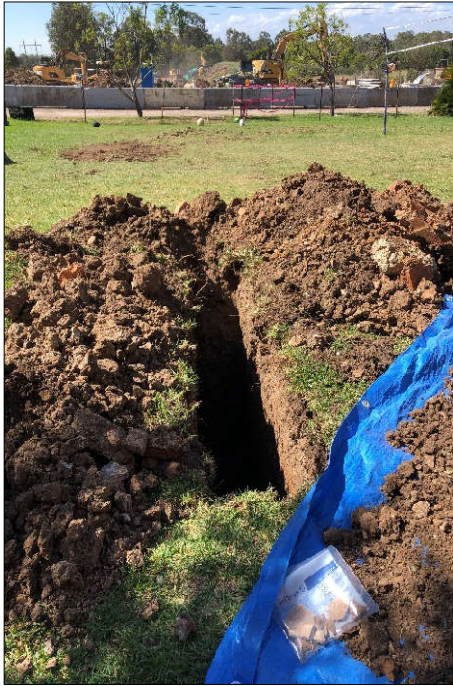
Fill excavated from TP8 with non-fibrous plaster fragments.
